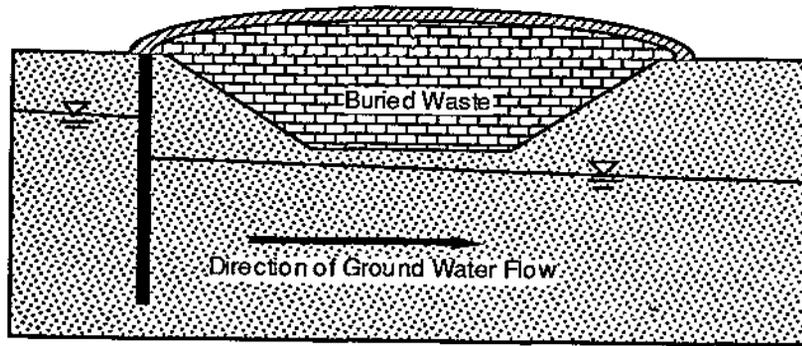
Example of Vertical Cutoff Wall to Limit Flow of Ground Water through Buried Waste.
